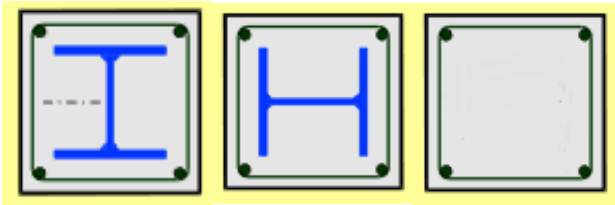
Steel-reinforced concrete sections or SRC. Source: G. Hansville: Eurocode 4 composite columns. [14].
